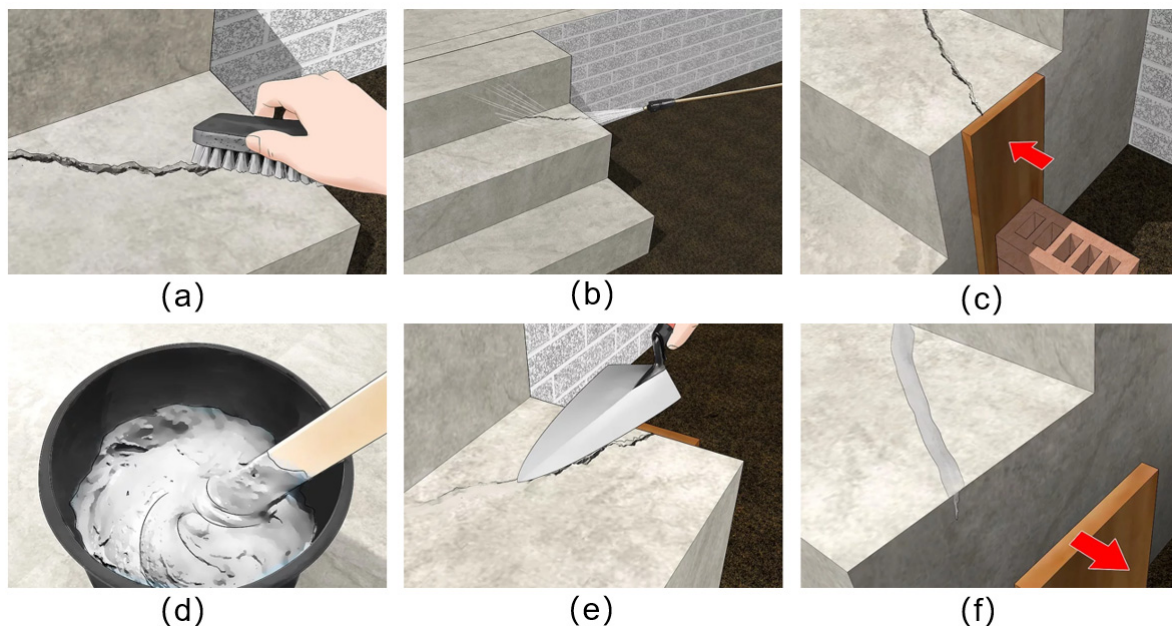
Steps to repair a crack wide than 0.64 cm in stair with a vinyl concrete patcher (wikiHow, 2023)
